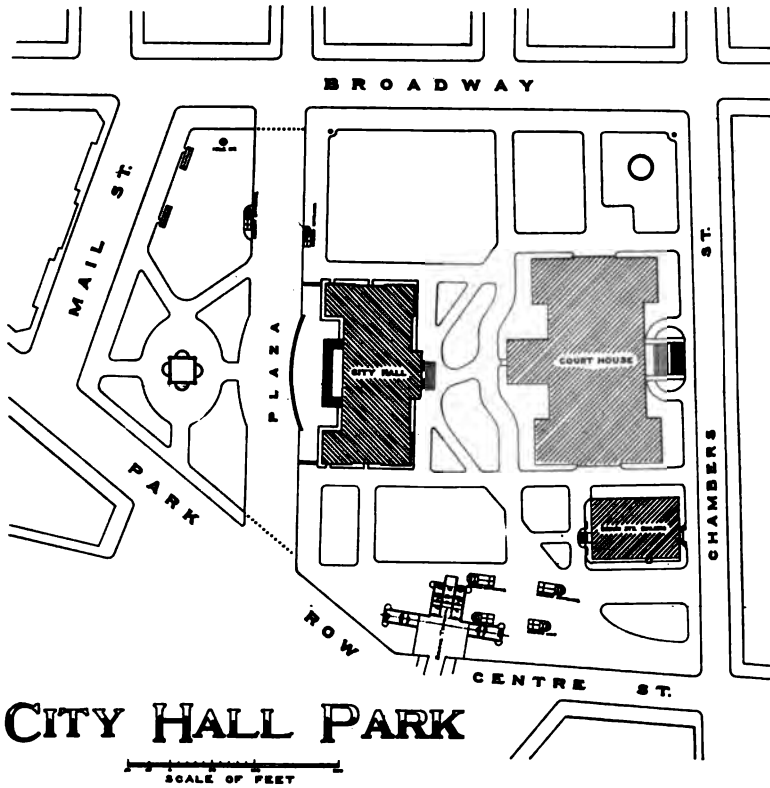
CITY HALL PARK, WHICH SHOULD BE REBUILT TO SERVE AS A BETTER SETTING FOR THE BUILDING AND TO GIVE A BETTER ARRANGEMENT OF WALK.
